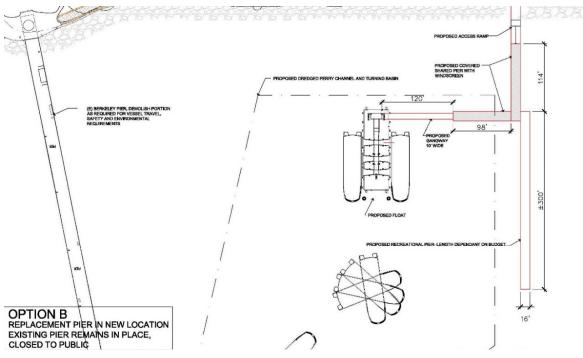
2018 Option B Ferry terminal at new South Pier location
